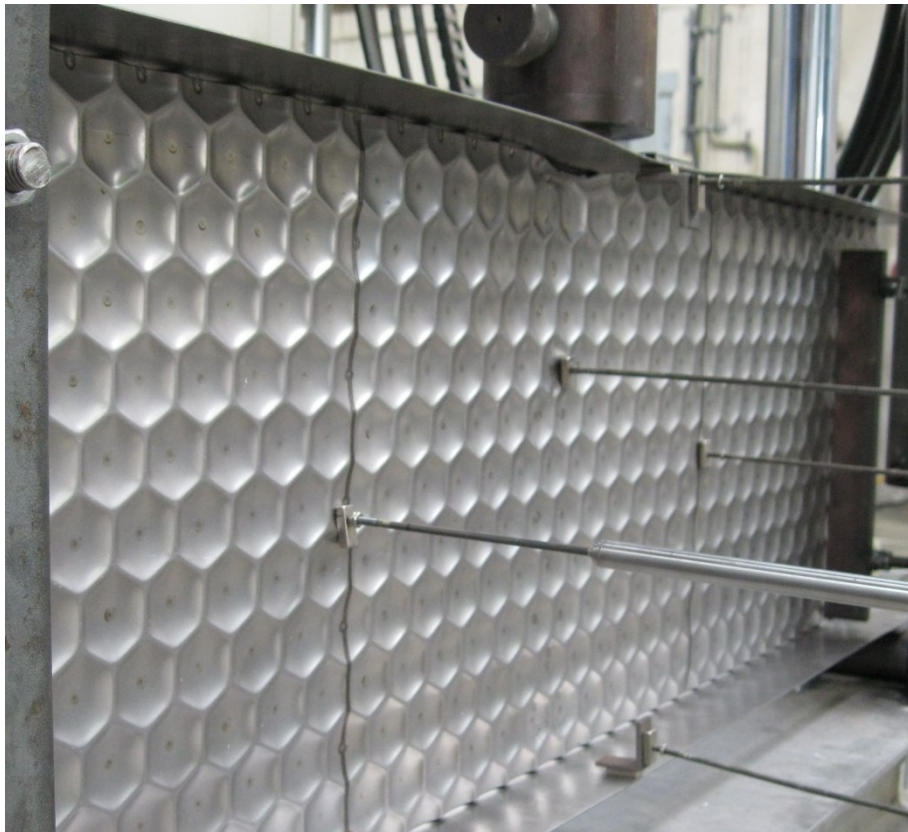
Beam 8 side view (flat 1.00 mm + structured 0.50 mm)
